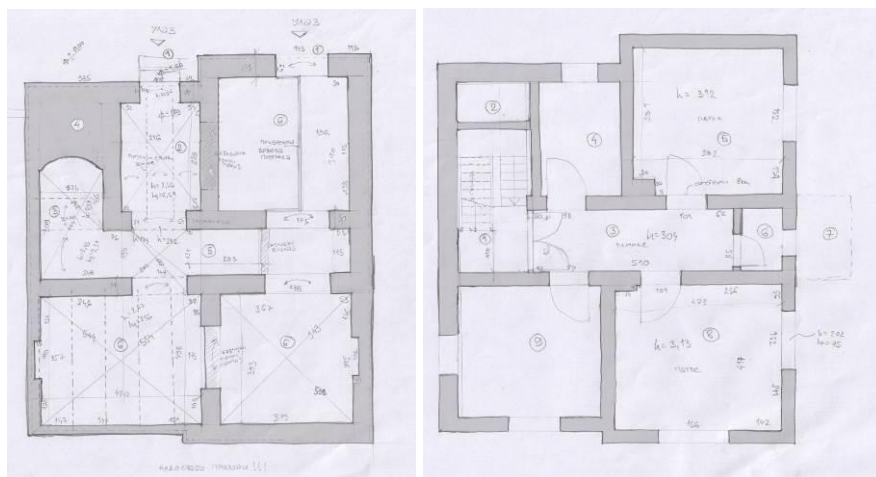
“Ilkovo zdanie”, basement layout (left) and of the floor (right), field drawings, I. Cvetković, 2020, [2]
